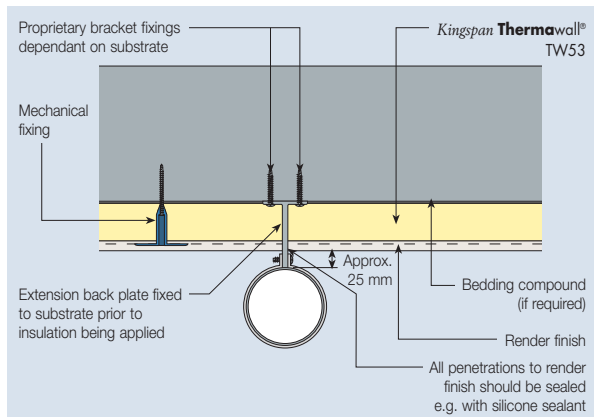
Drainpipe Extension Detail (Applicable to a Variety of External Building Ancillaries)
